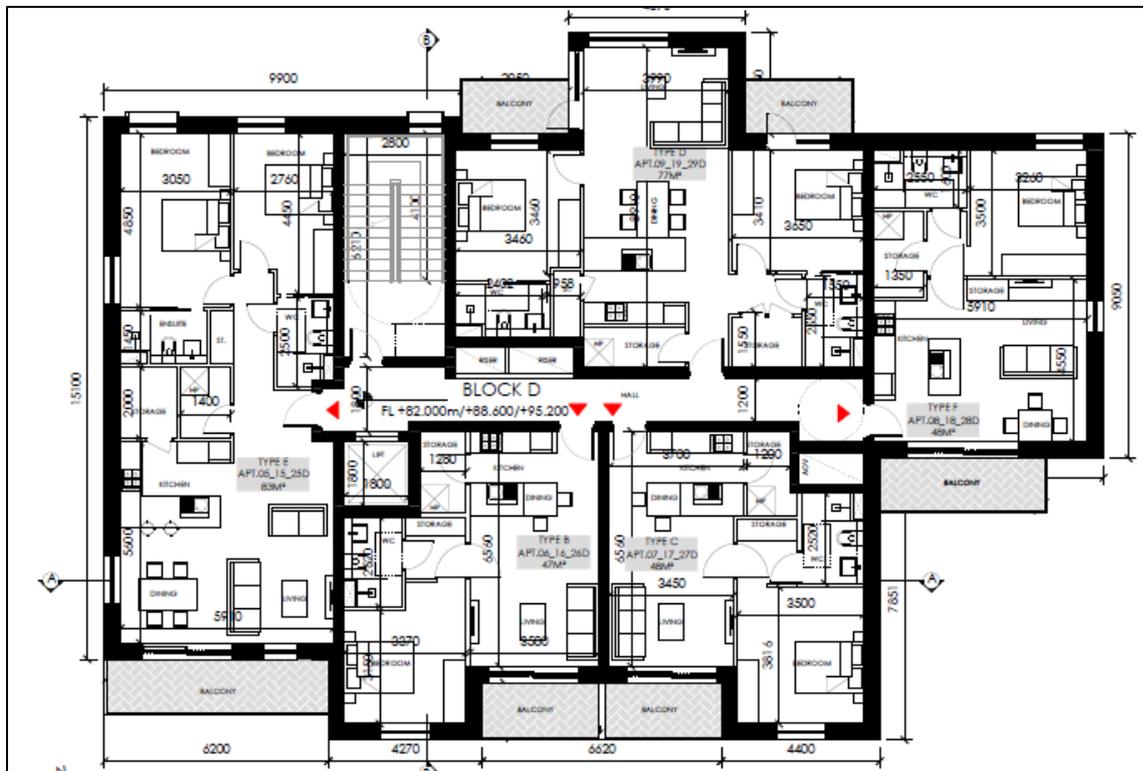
Typical First/Third and Fifth Floor Plan of the proposed Block D
